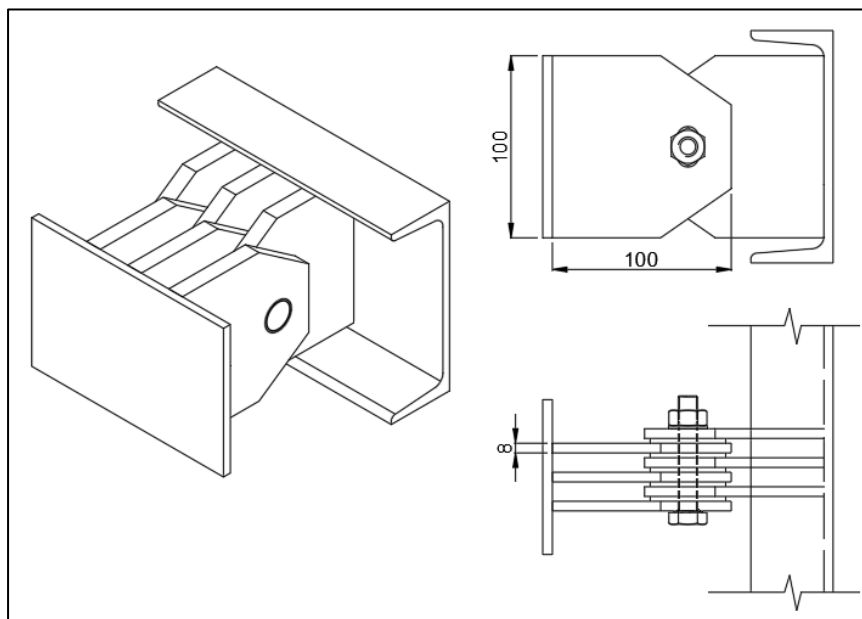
Connection detail between the existing building and the exoskeleton.
